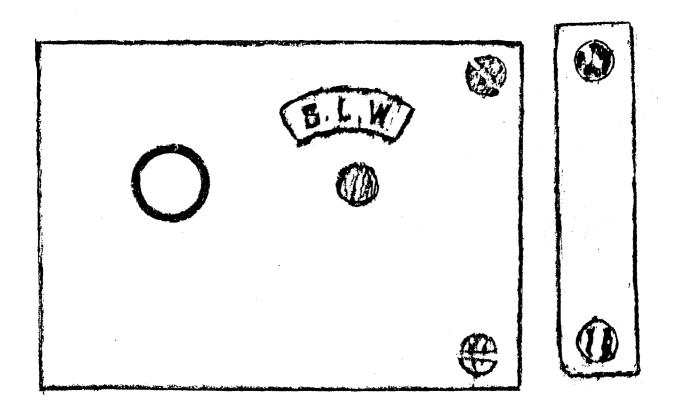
THE LOCK FACING ON THE EXTERIOR DOOR IN THE KITCHEN AREA (Rubbing Study)
